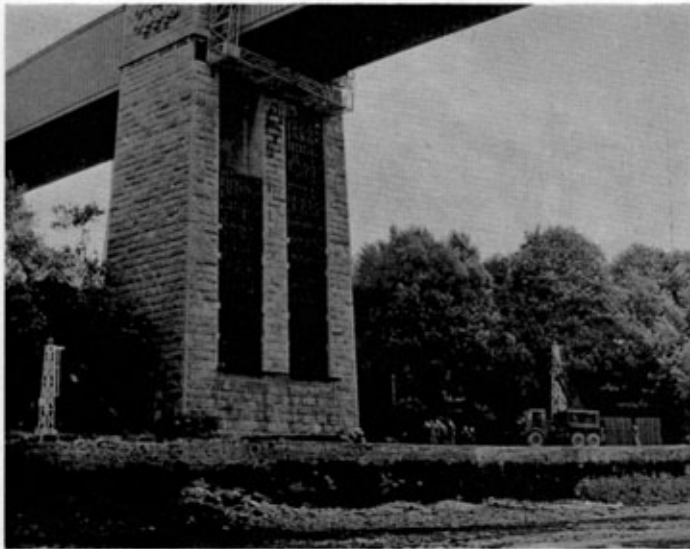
Partially completed Bailey towers—Caernarvon Pier
